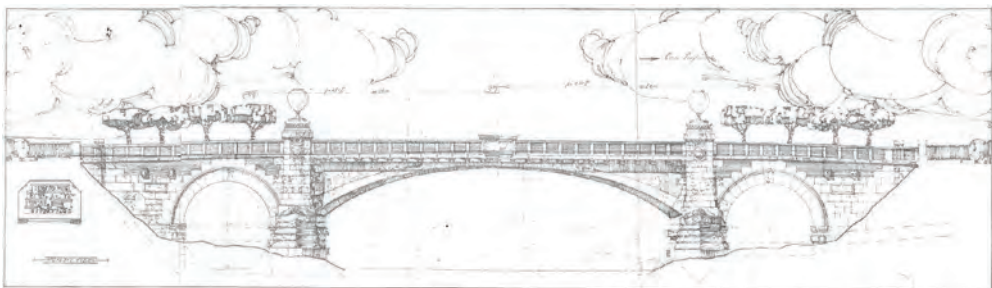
Ponte Nomentano, Rome, upstream elevation, 1938.
